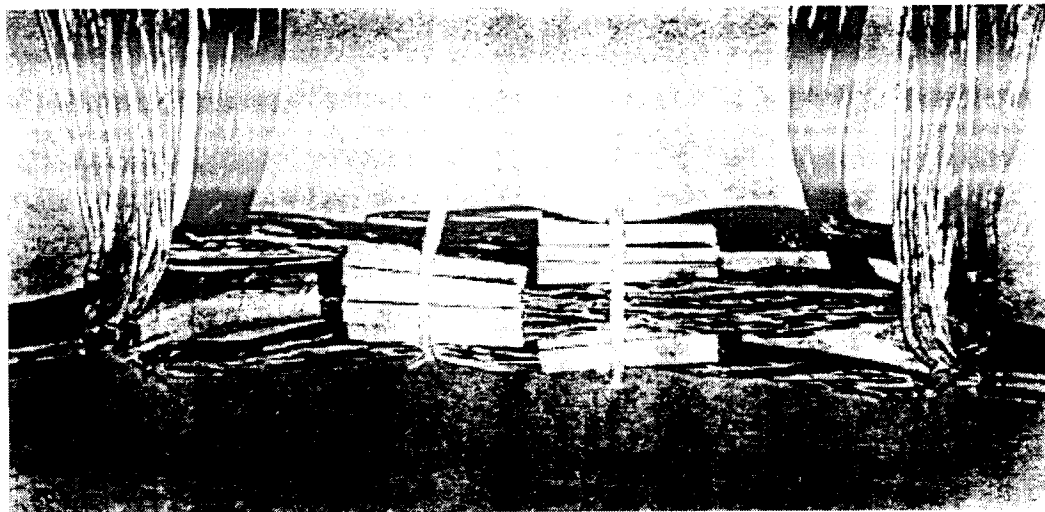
Tying Outer Banks of Connectors to Core of Cable
